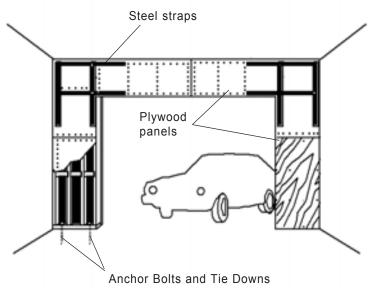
Bracing garage walls. If your house has a room over the garage, the garage walls may not be strong enough to hold up during an earthquake unless they are braced with plywood panels and steel straps.
